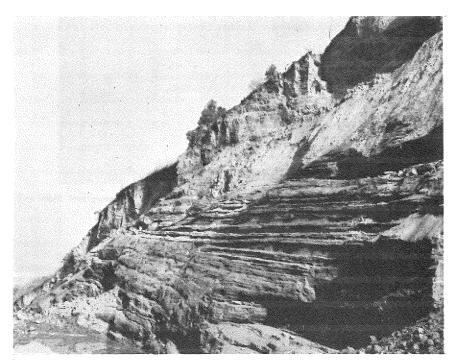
Effects of water erosion on foundation strata on east face of breach, December 22, 1963.
